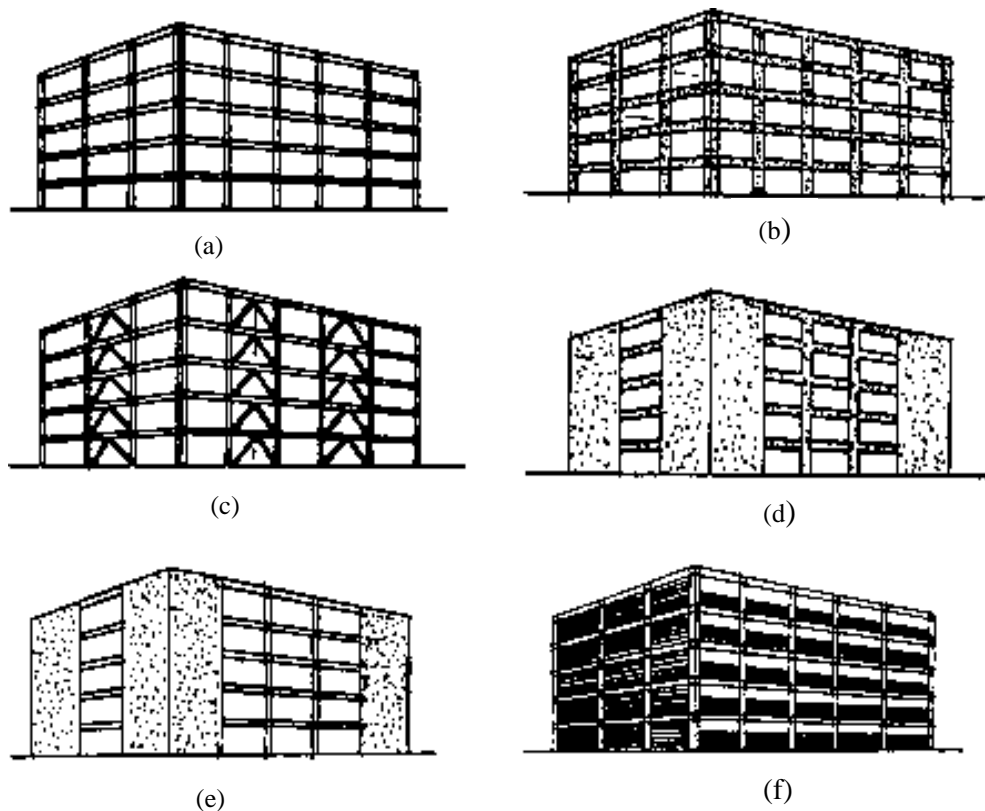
Lateral-Force-Resisting Systems: (a) Steel Moment-Resisting Frame; (b) Reinforced Concrete Moment-Resisting Frame; (c) Braced Steel Frame; (d) Reinforced Concrete Shear Walls; (e) Steel Frame Building with Cast-In-Place Concrete Shear Walls; (f) Steel Frame Building with In-Filled Walls of Nonreinforced Masonry. (Taranath, 2004)
